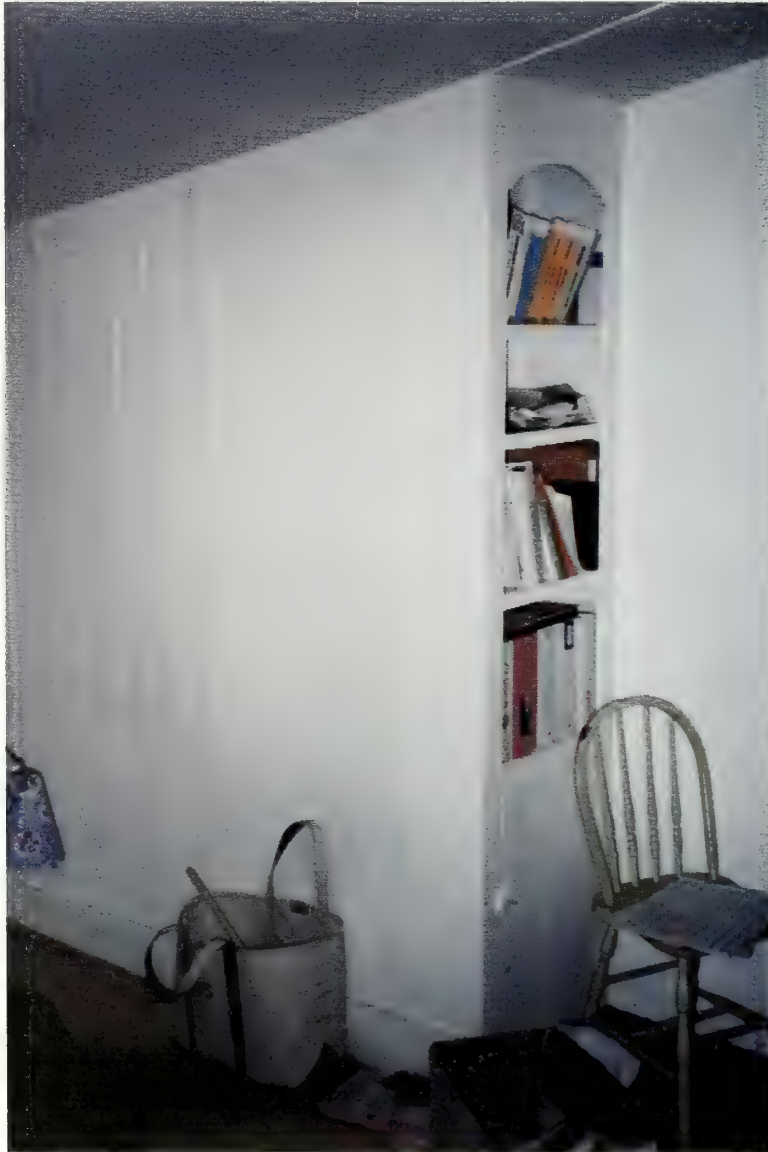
View of a board partition wall in room 207 showing one type of beaded board found in the Clara Barton House.
